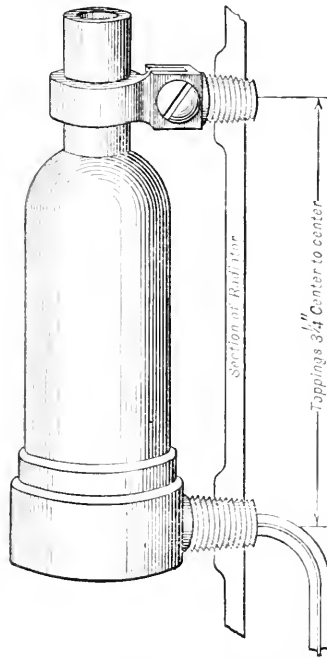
EXTERIOR OF STEAM-AIR VALVE WITH HOLDER.
